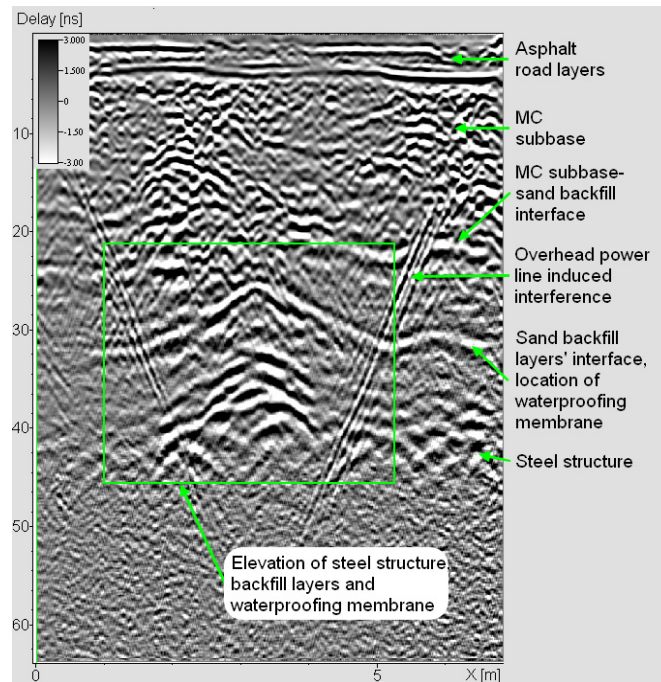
Transverse cross-section of the culvert (scan no. 27) with structural elements indicated.
